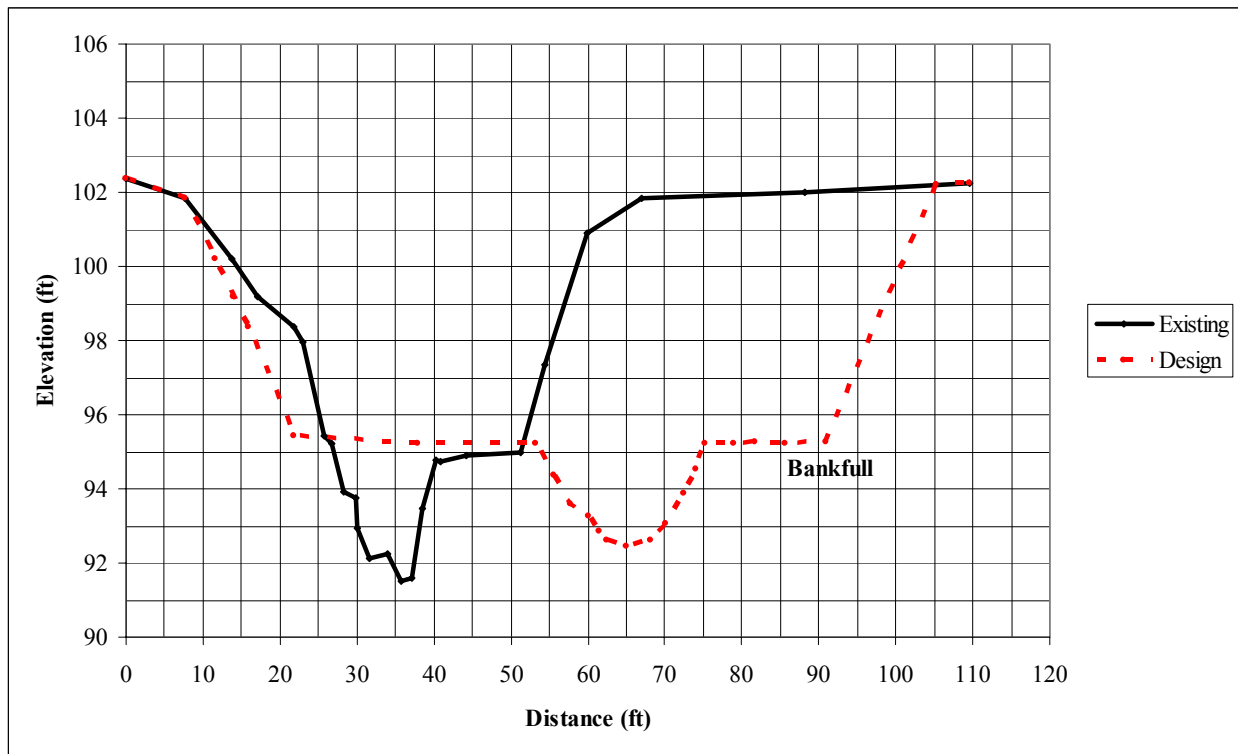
Reach 2 at Cross Section F Facing Downstream.
